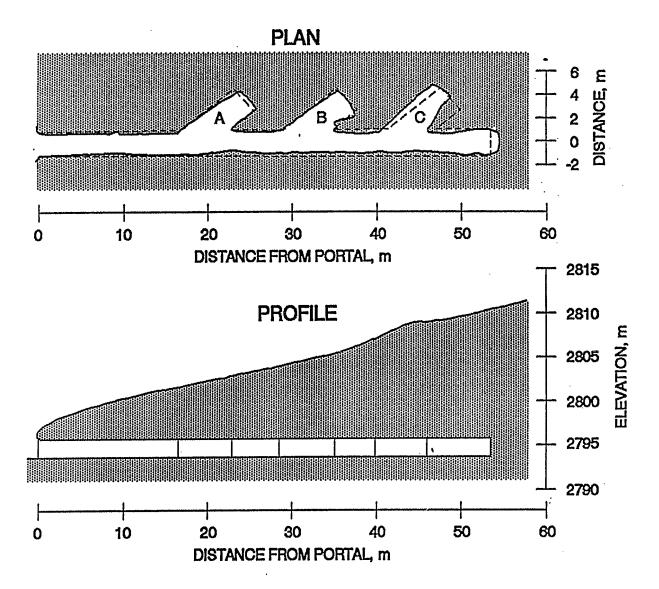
Longitudinal tunnel cross-section (plan and profile) for 1/3-Scale Camp Stanley Validation Test. Letters identify donor (B) and acceptor adits (A and C).
